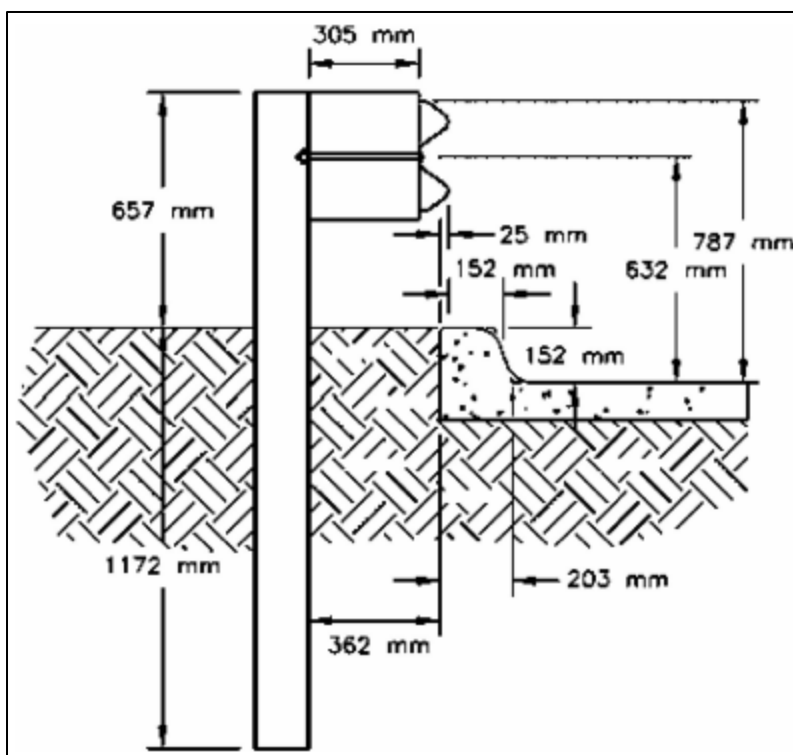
Side View of the Midwest Guardrail System (Faller et al., 2004)
